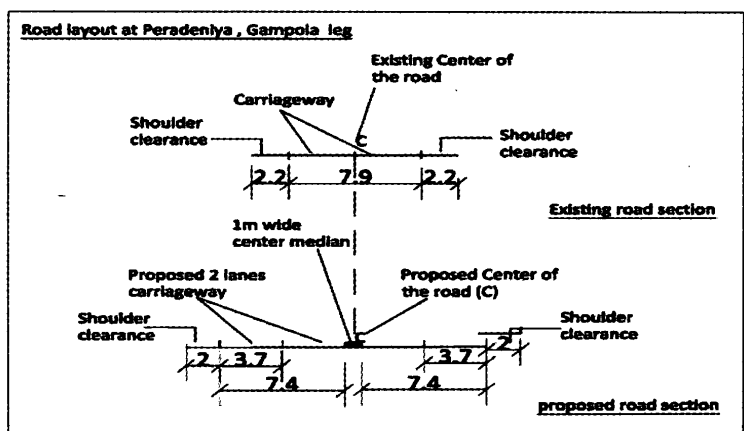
Geometric details of existing and proposed road sections for Gampola leg
